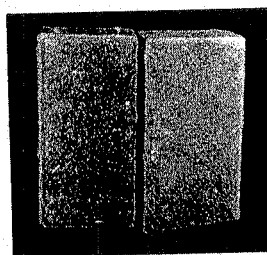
Spacer bars on the sides of concrete pavers are essential for mechanical installation.
